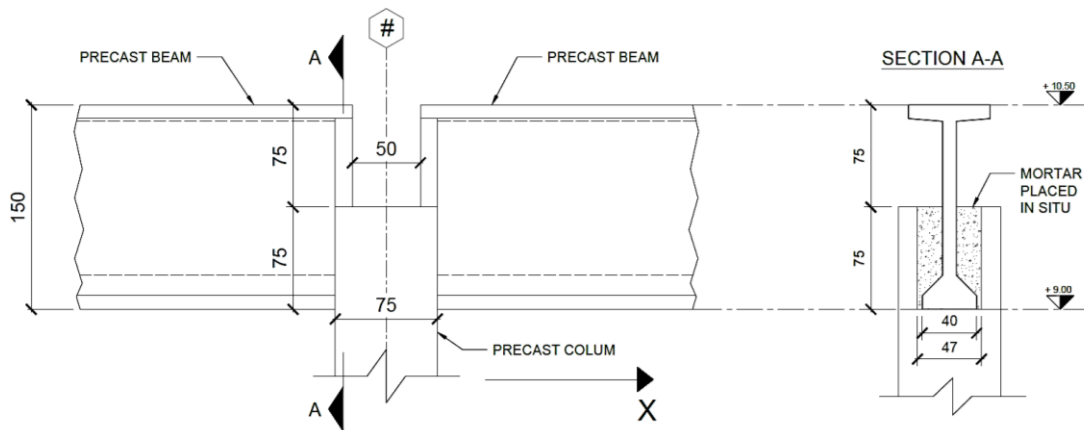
Wet joint detail for columns between the extreme axis (units in cm).
